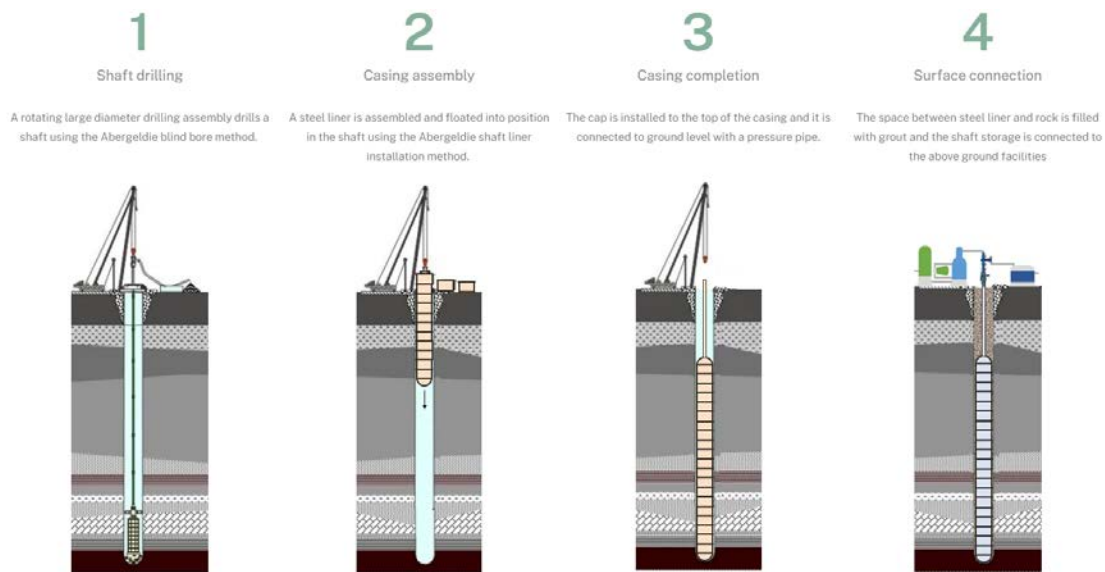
Construction of underground storage shafts. Figure from (Arden Underground Storage, 2022).
